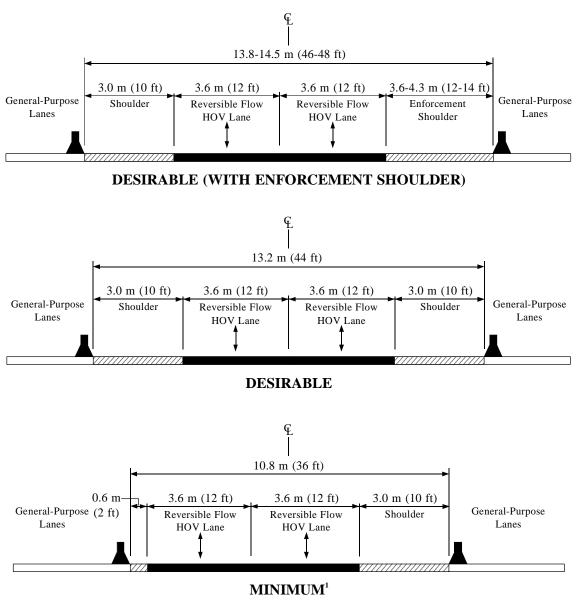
Examples of Cross Sections for Barrier-Separated Reversible HOV Lanes
